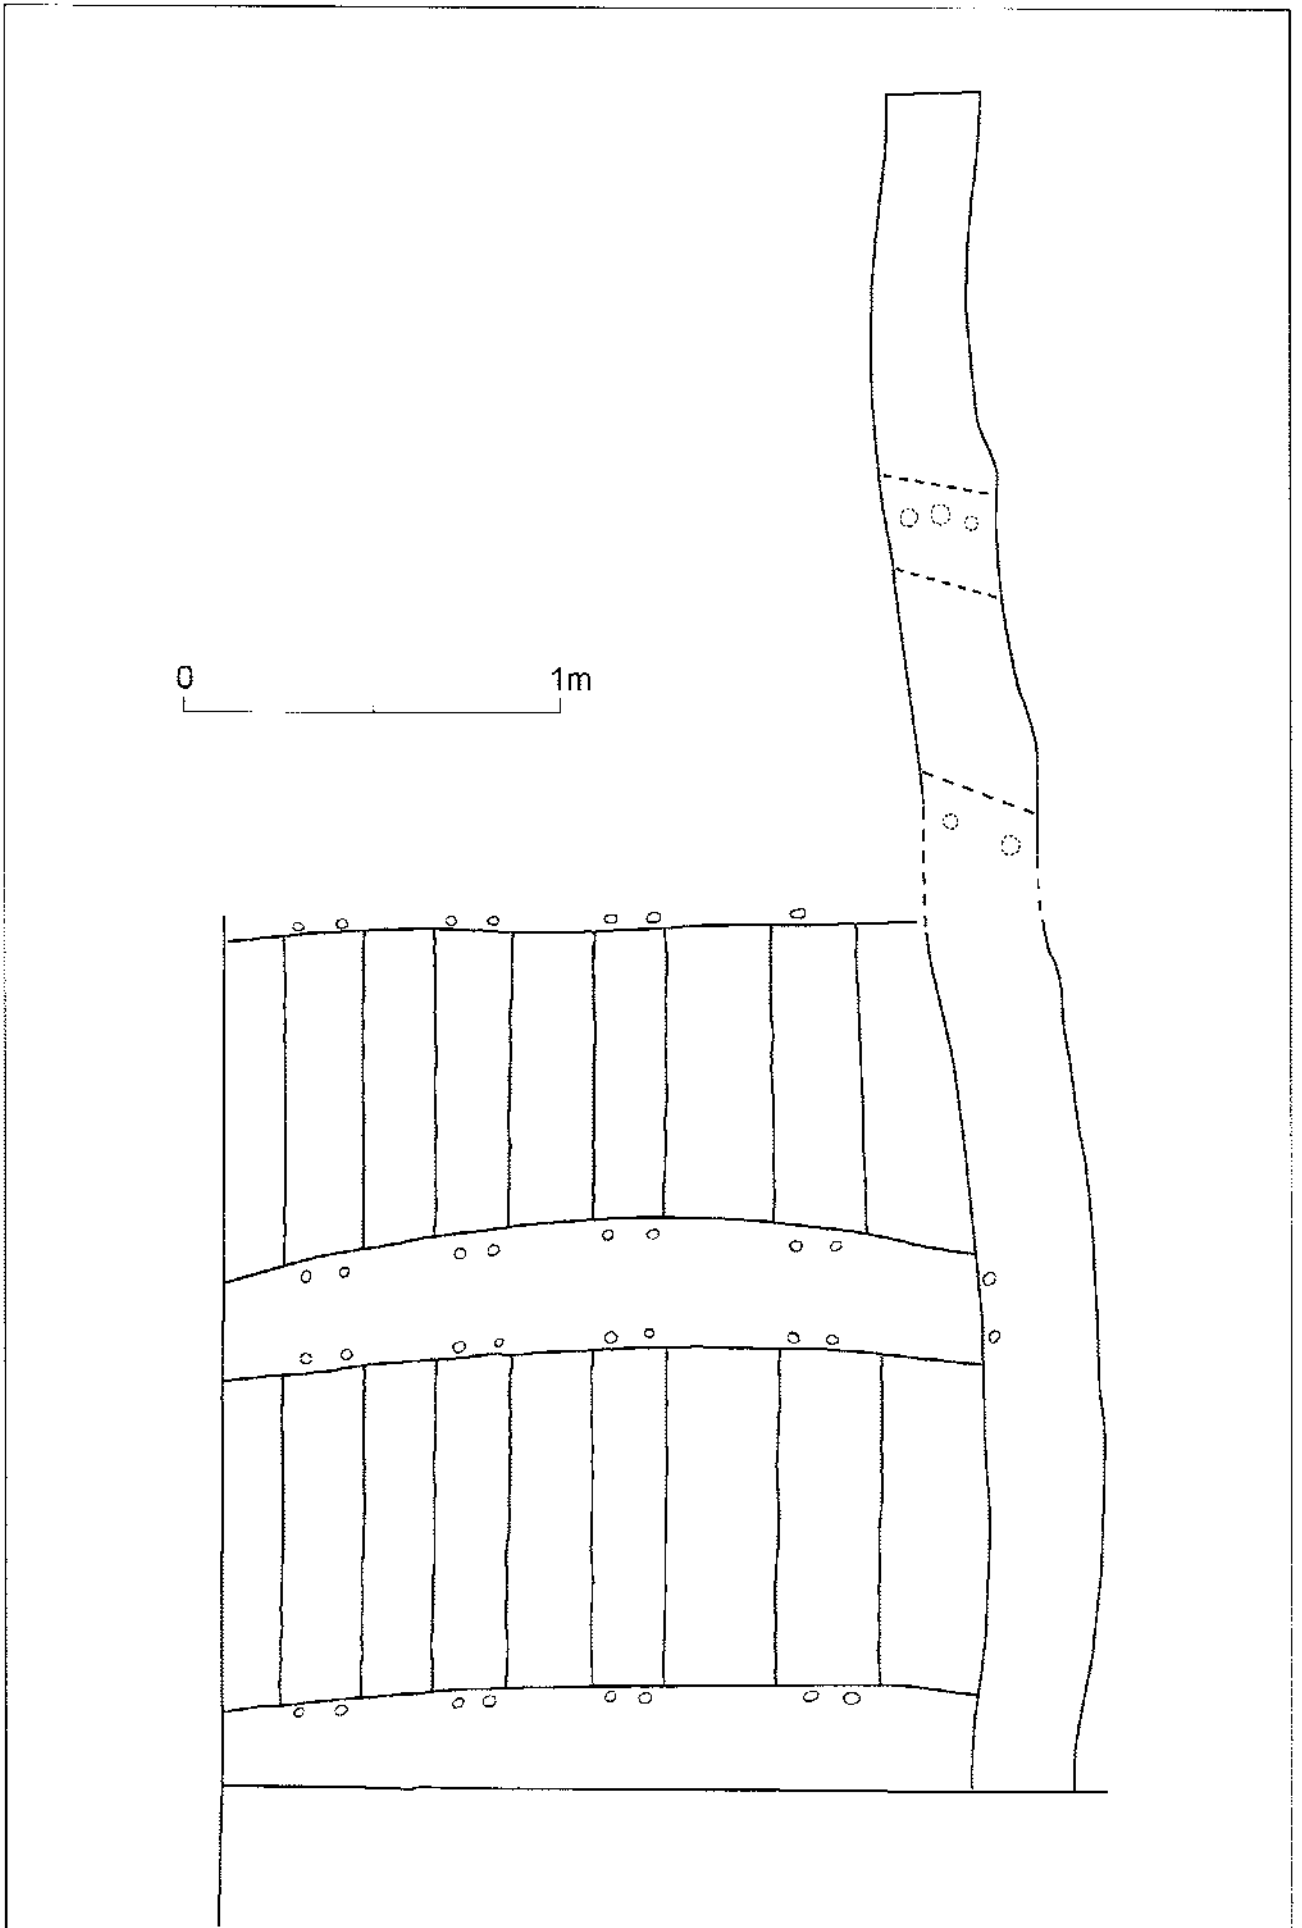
Reused Timbers in North Wall of Farmhouse from the North
